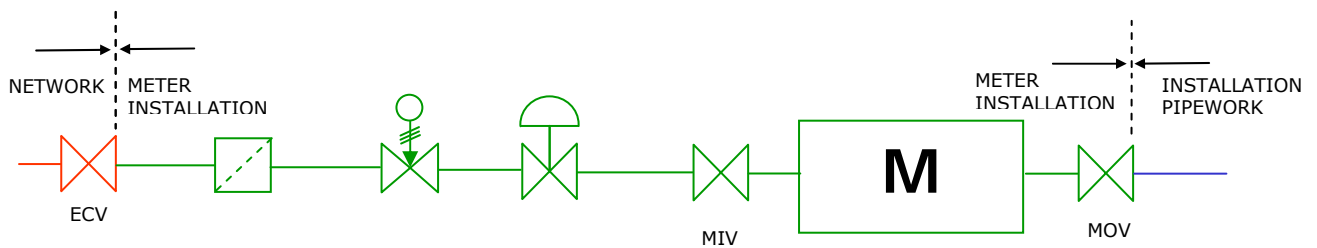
RECOMMENDED ARRANGEMENT.
